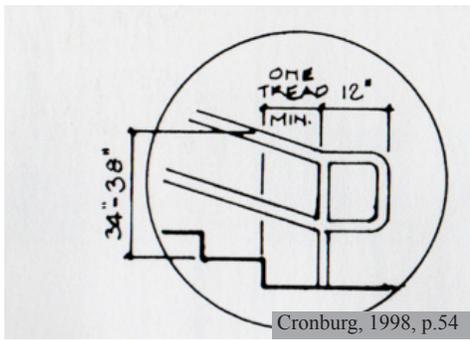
Handrails are required to have horizontal extensions beyond the bottom and top of stairs.
